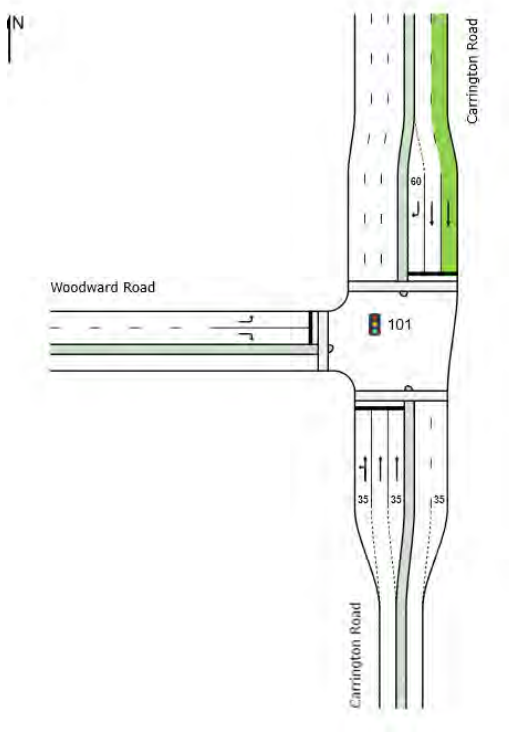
SIDRA layout for Woodward Road / Carrington Road (green sections represents bus lanes)
